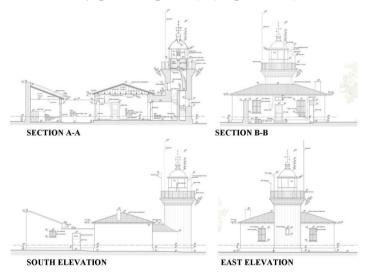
İğneada Lighthouse section and elevation (survey drawing) (courtesy of H. Çiğdem Zağra Öz) (Zağra, 2016)
